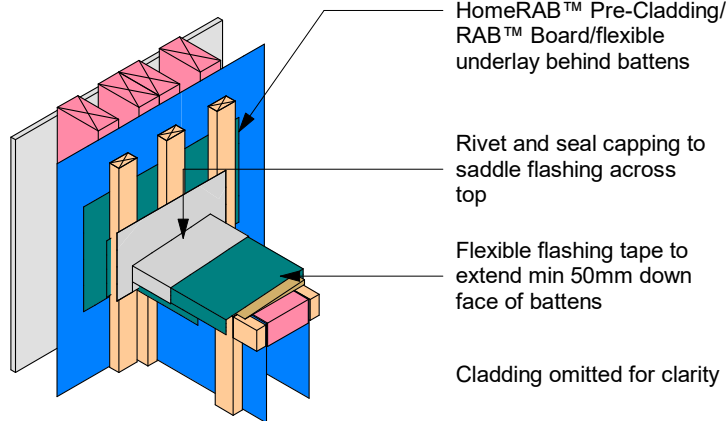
Enclosed deck balustrade to wall junction aluminium internal corner
